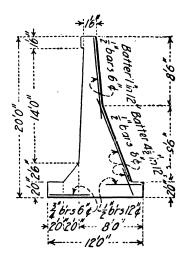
RETAINING WALL, C. B. & Q. R. R.
